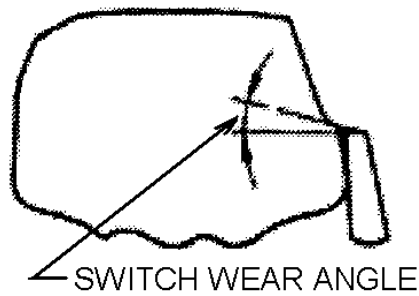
Stock rail side wear and switch blade width/height detail:
